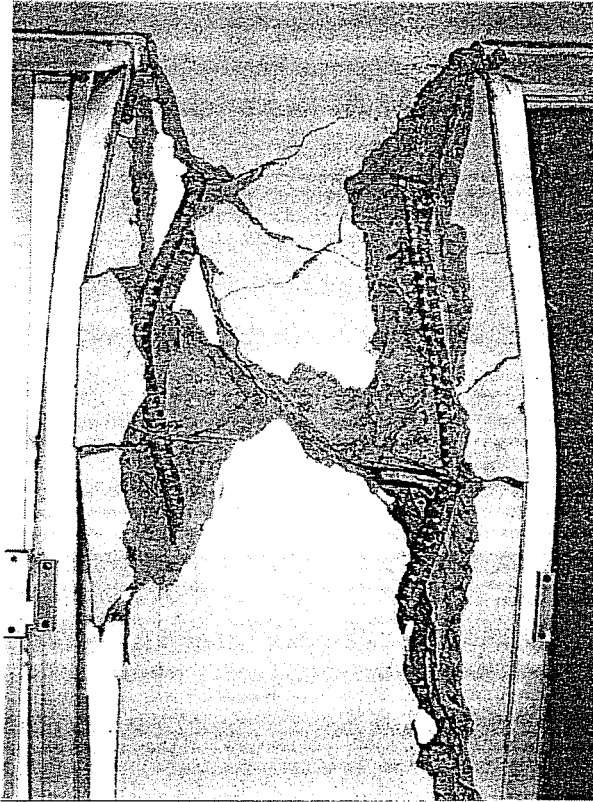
Failure Region of Column A-8 Between Fourth and Fifth Floor
